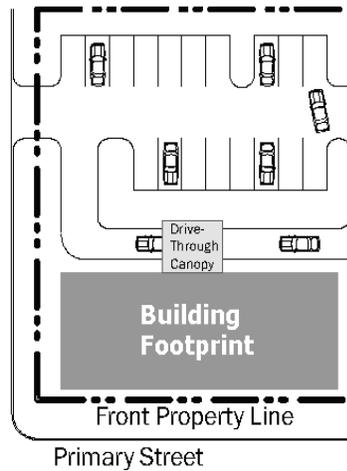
C (1). Recommended drive-through Facility layout.
